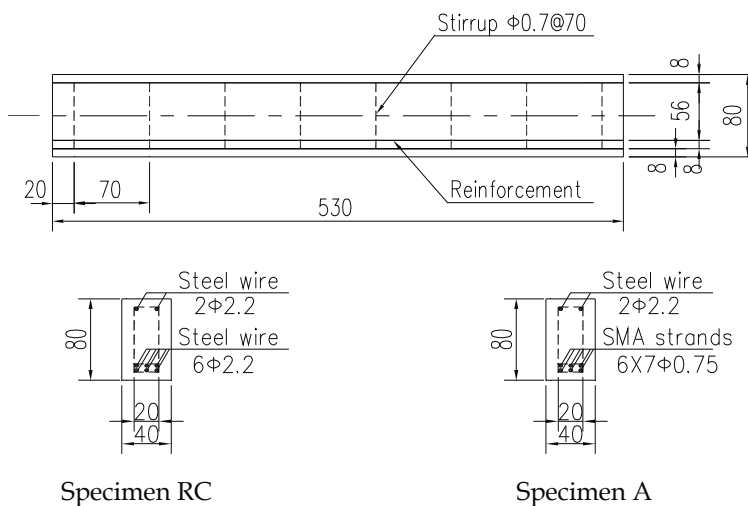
Dimensions and reinforcement arrangements of specimens (Unit: mm)
